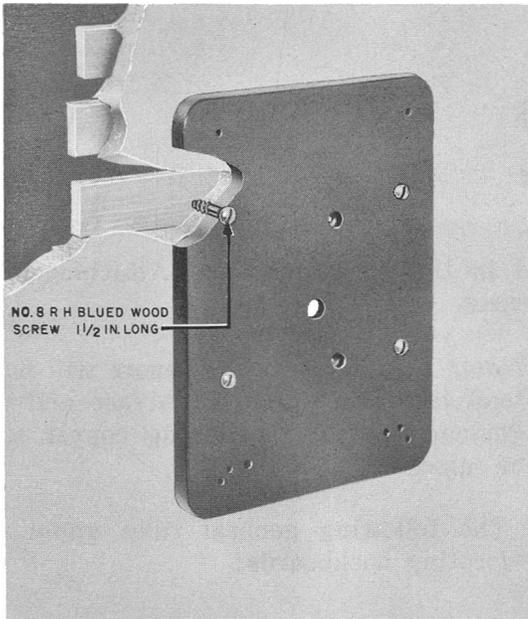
147A Backboard Mounted on Plaster and Lath
